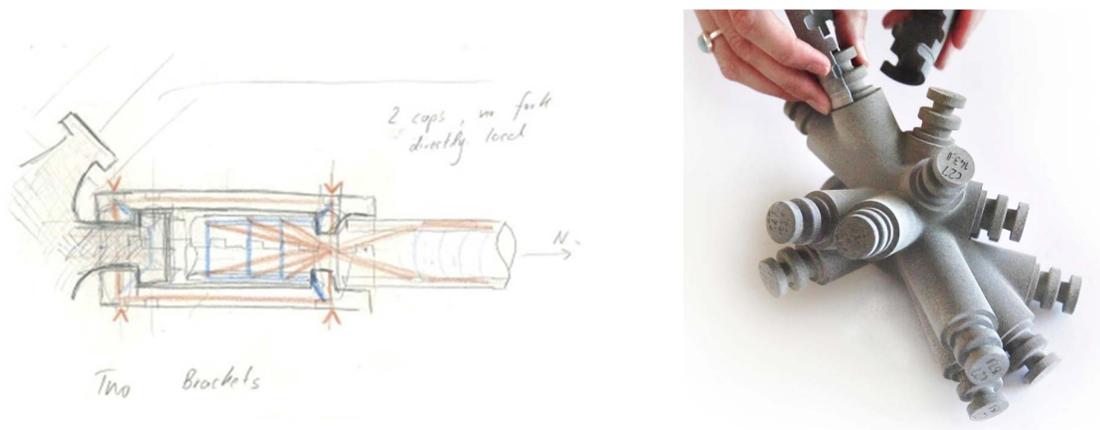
Equilibrium-based methods provided the basis for developing a connection that fulfilled the mechanical requirements and ensures the required hinge behavior and assembly tolerance. [Photo: A. Bargetzi]
